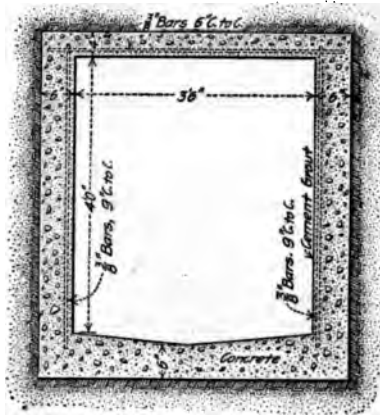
Section of Salt Lake City Conduit in Excavation.
